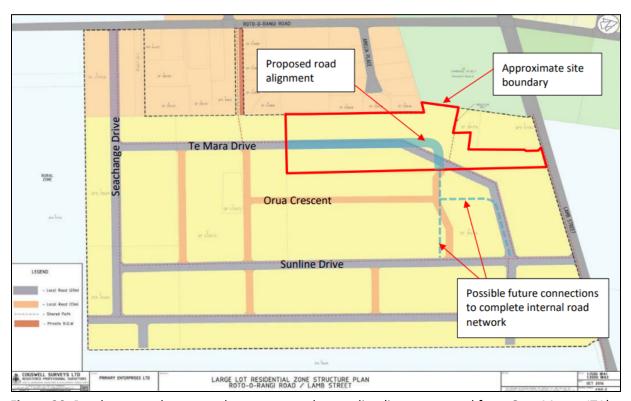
Road proposed compared to structure plan roading (image sourced from Gray Matter ITA).
